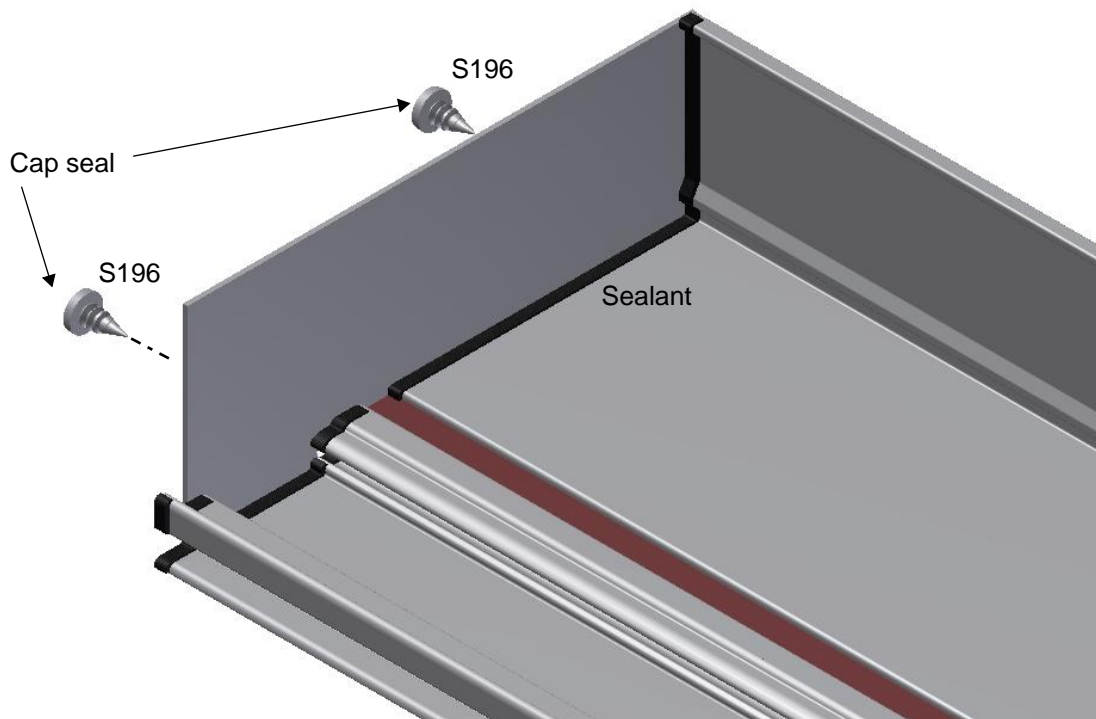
Attach an end dam to the end of the sill flashing at a masonry wall.
